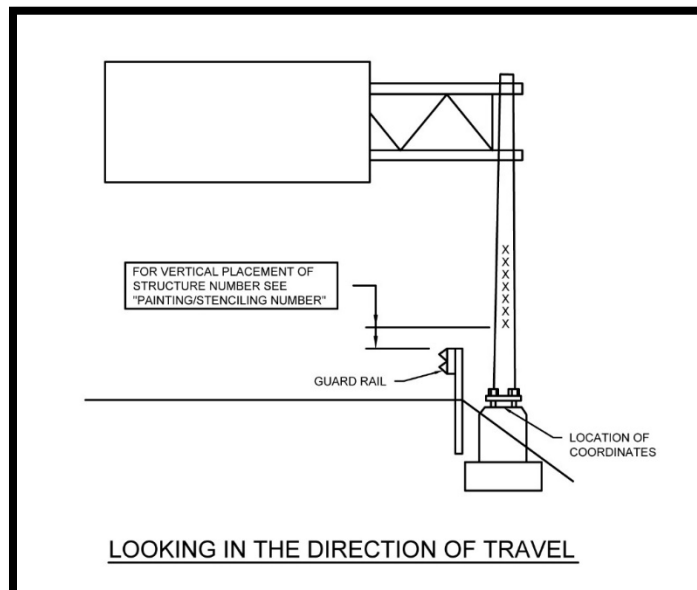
STENCILING FOR CANTILEVER STRUCTURES
